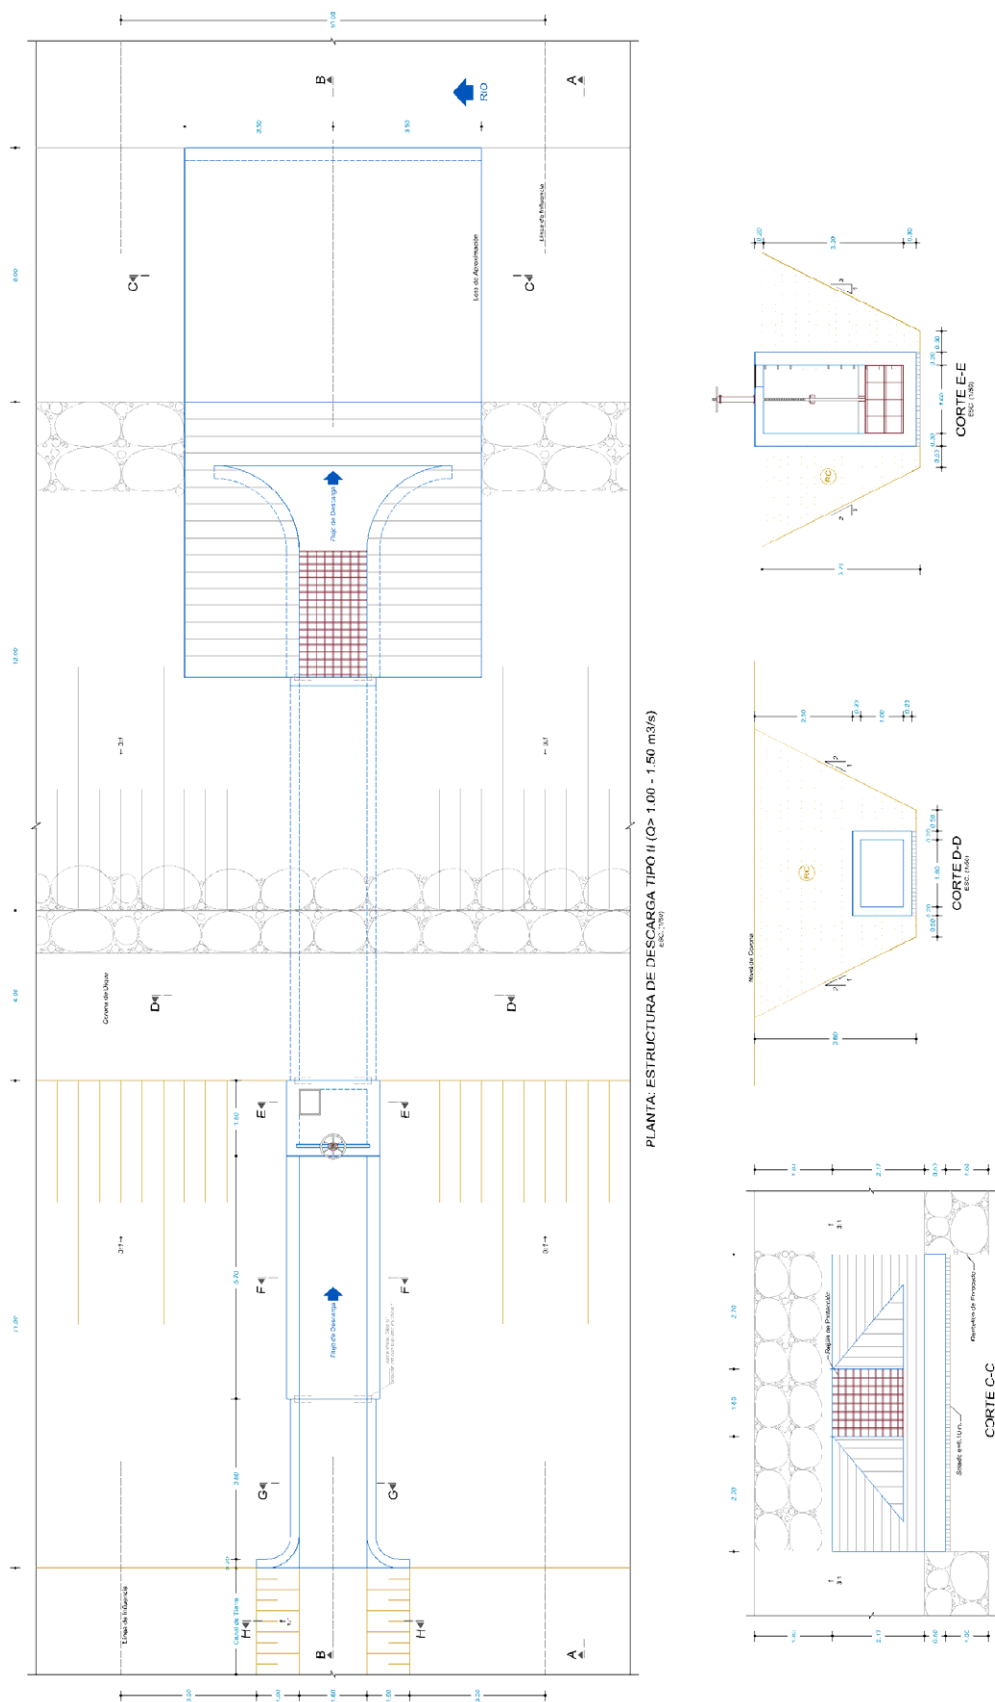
Structure Drawing of Drainage Facility Type II (1/2)
